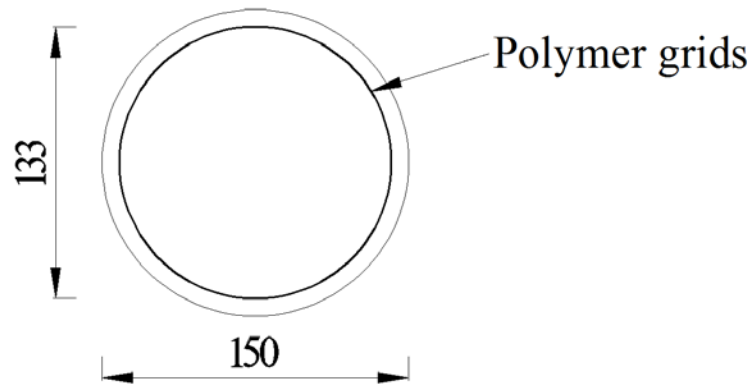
Cross-section view of concrete specimens (All units in mm)
